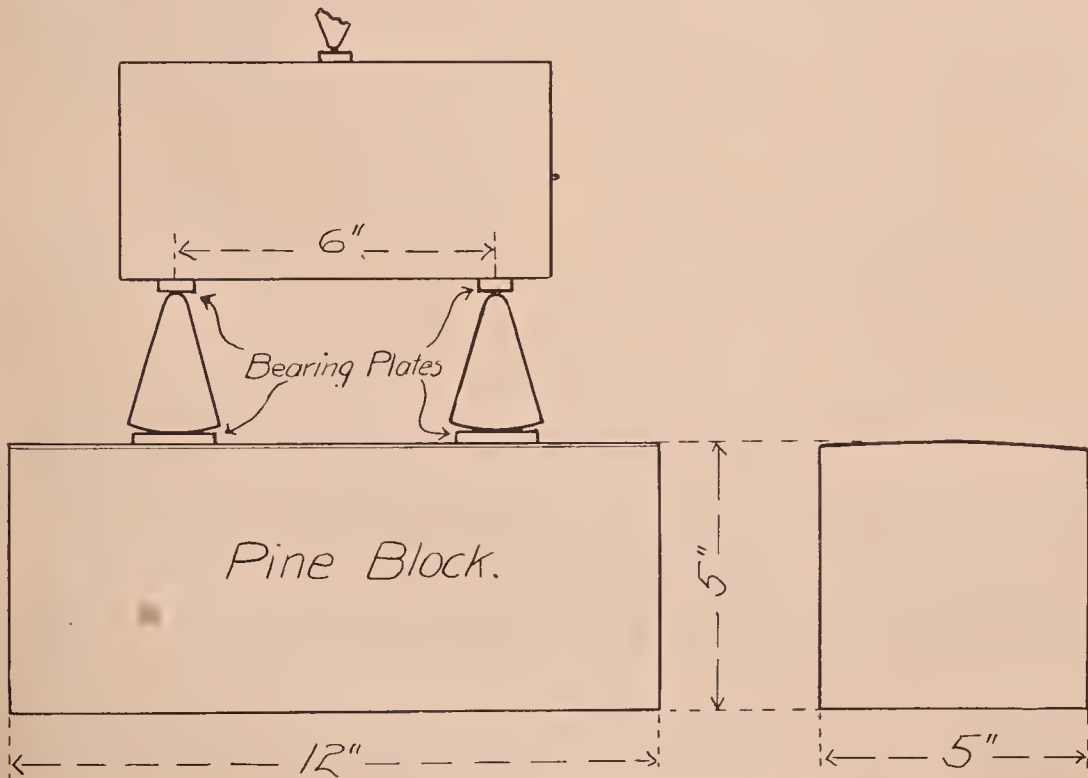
Arrangement for testing cross-breaking strength of brick.
